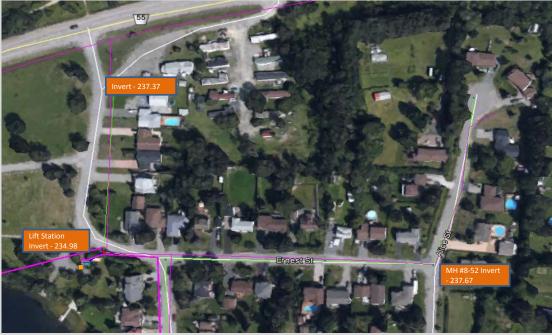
Manhole location and invert elevations surrounding Simon Lake West Lift Station
